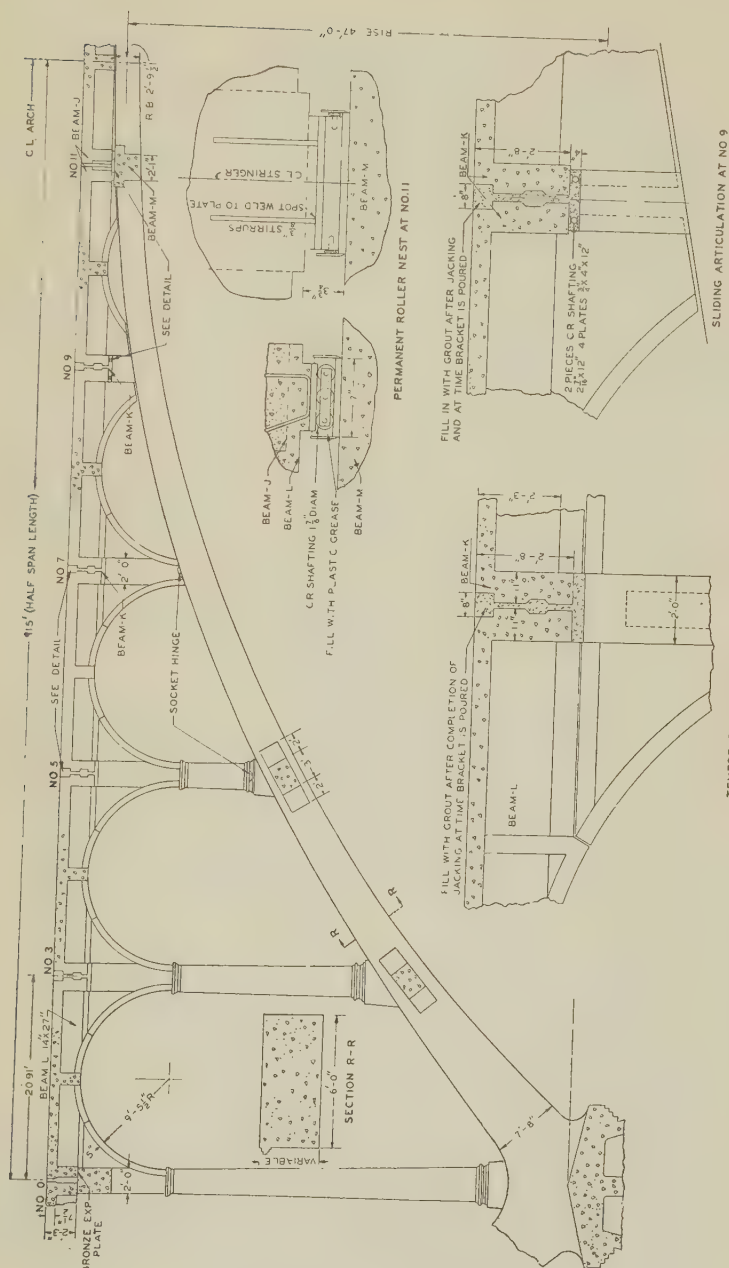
HALF SECTION OF ARCH WITH DETAILS OF SUPERSTRUCTURE ARTICULATION
